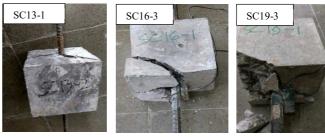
The splitting failure pattern of slope rib bars specimen (SC)
